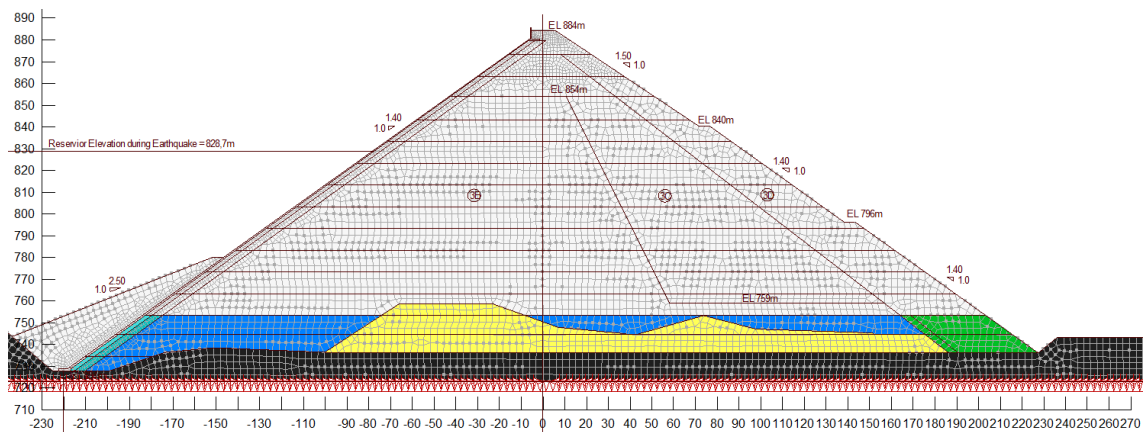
Zipingpu dam model – layered construction – placement of 3<sup>rd</sup> layer
